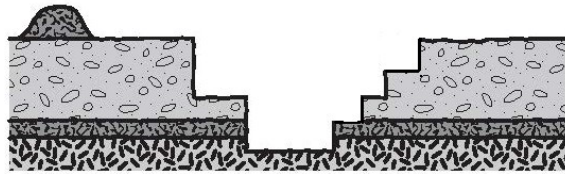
Example of excavating stairs into the trench to allow for safe entry
